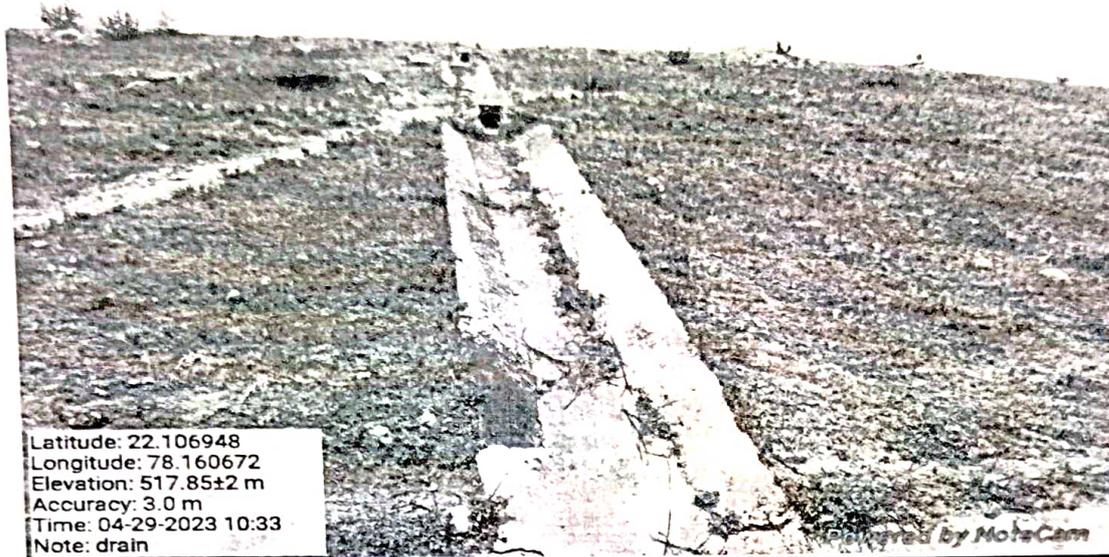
Draining across the ash dyke no. 111 using Plain cement concrete (PCC) pipes
